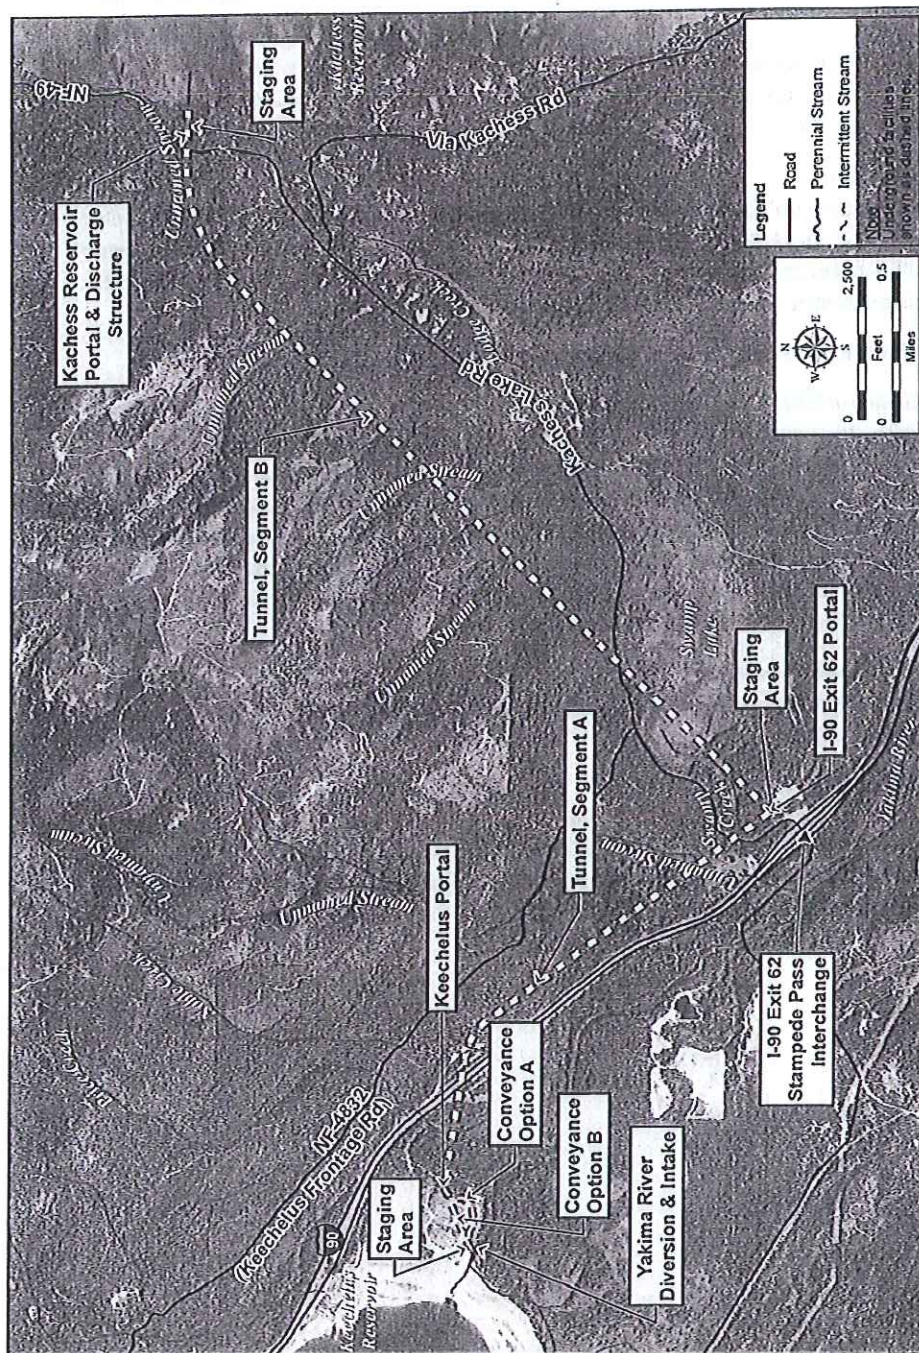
Alternative 3B – KKC South Tunnel Alignment Overview
